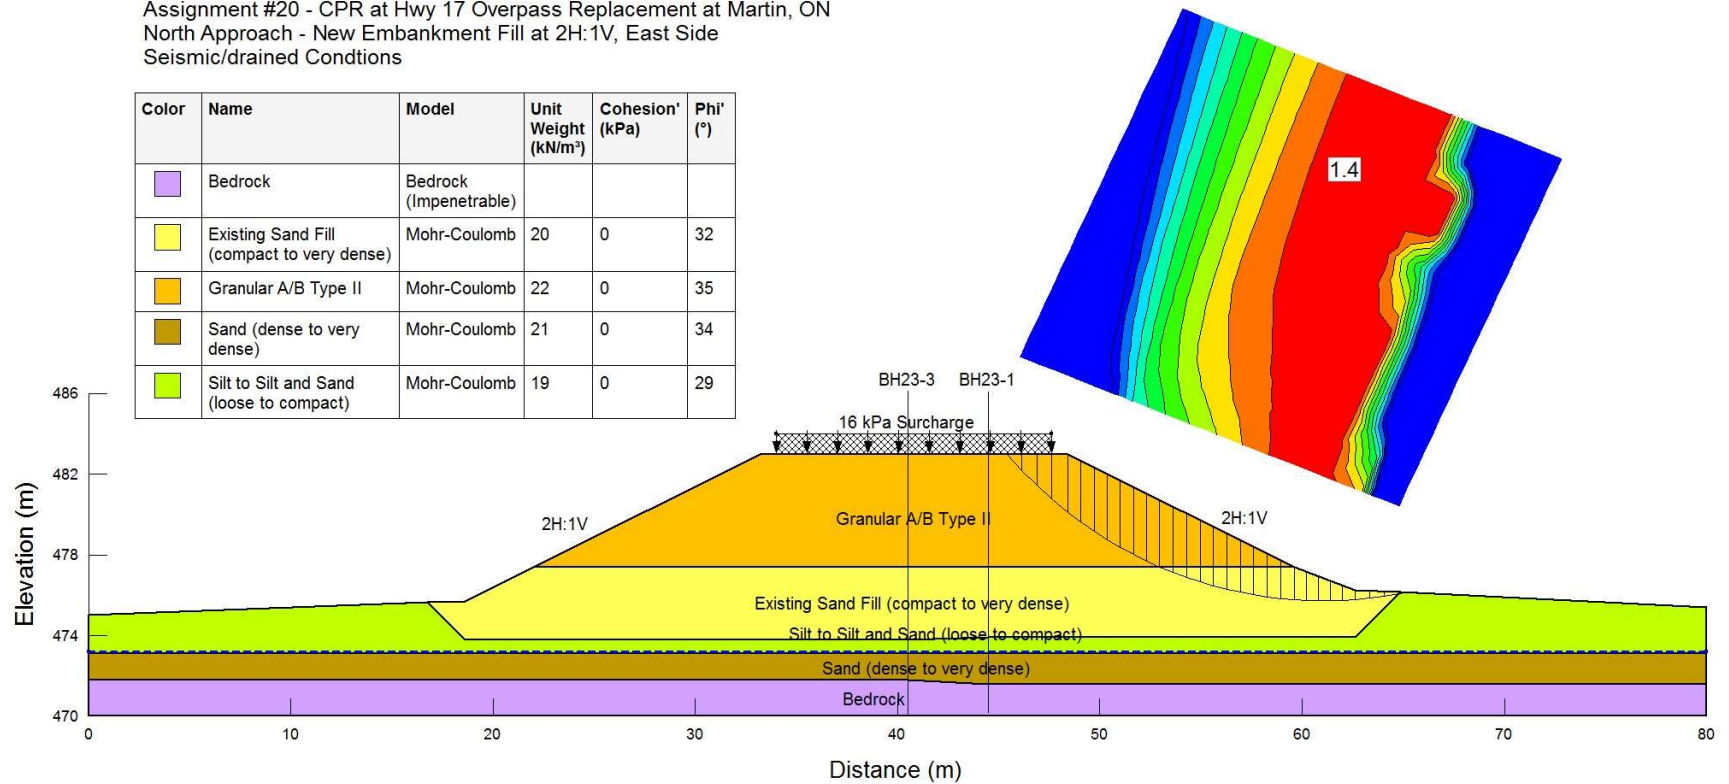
Slope stability Analysis for Approach Embankment Side Slope (East Side) – Drained Seismic Conditions
